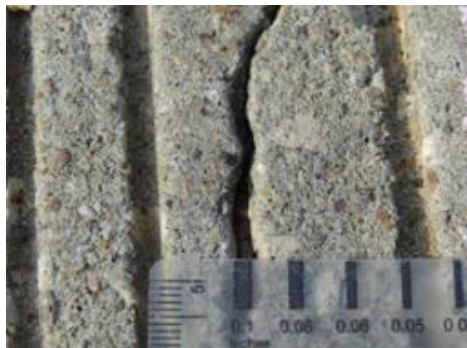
Transverse Cracking on Bridge Deck with a Measured Crack Width of 0.1 Inch
